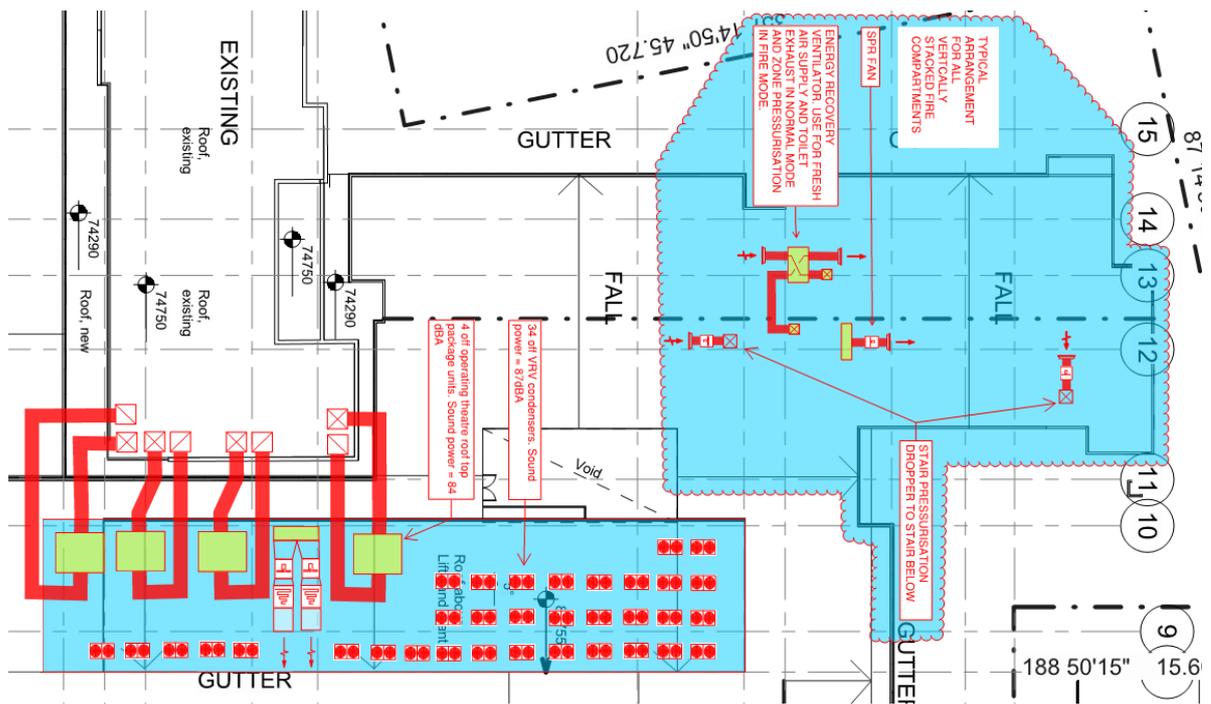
Layout of equipment within the plantroom in the mechanical drawings provided by Erbas
